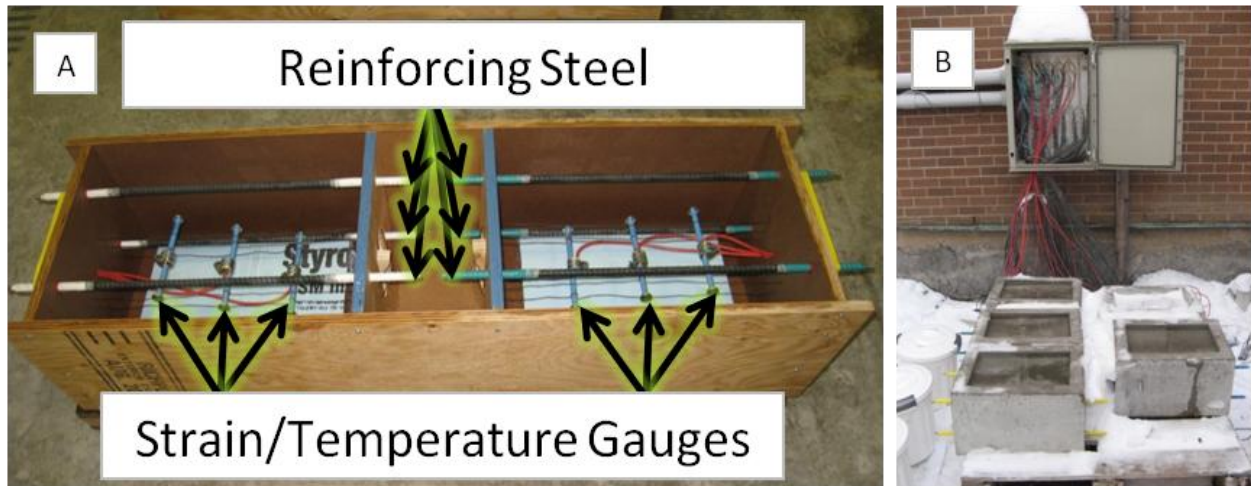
(A) Fully constructed mould with gauges, rebar, and ponding well and (B) outdoor slab testing setup
